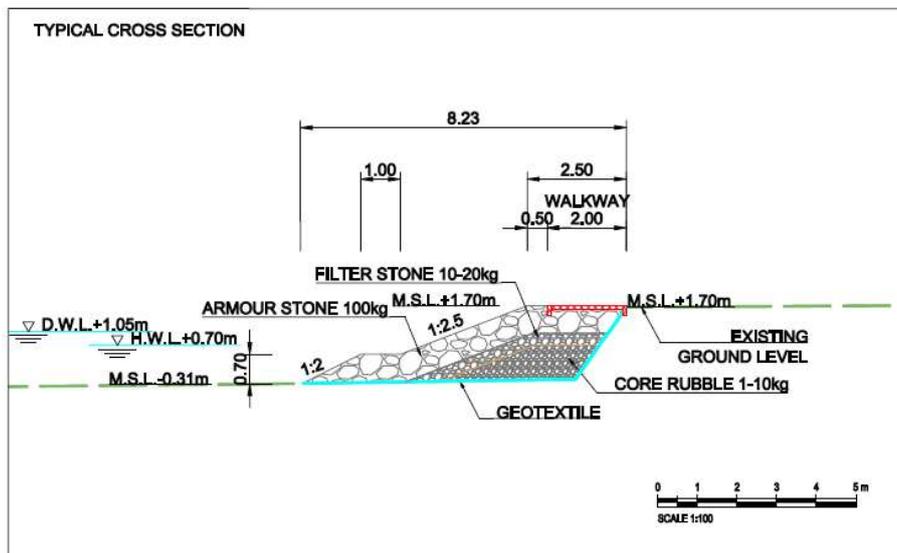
Typical Cross Section of Revetment at Isdhoo
